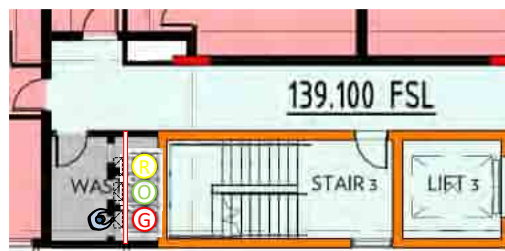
Chute disposal rooms for Buildings A1 West, A1 East and A2 Waste (located on Levels 1 to 3). Red = General Waste, Green = Food / Organic Waste and Yellow = Recycling.
